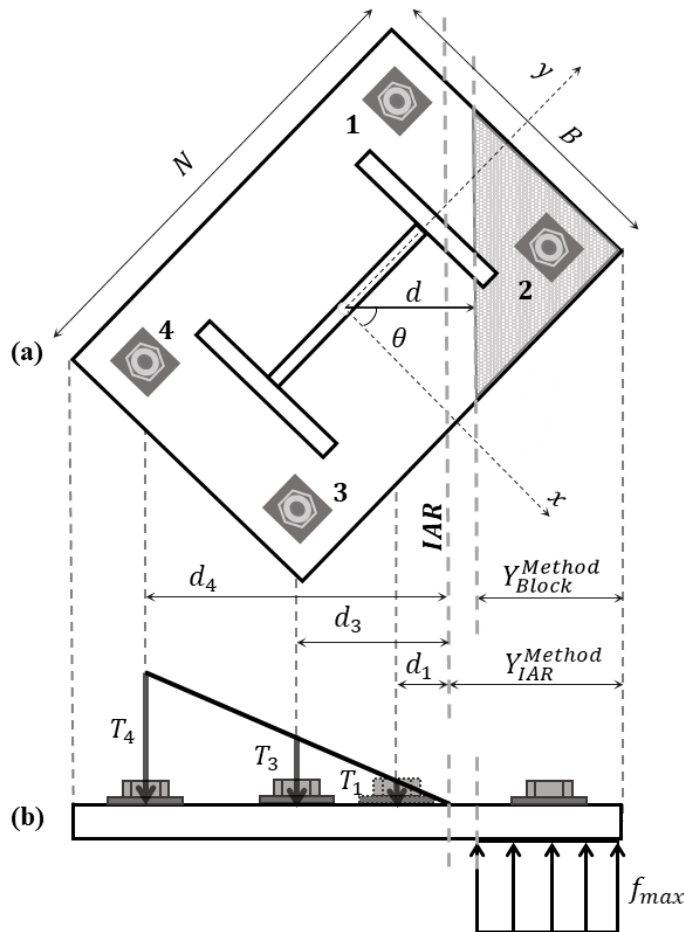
Schematic illustration of the proposed method (a) Plan view and (b) Elevation
